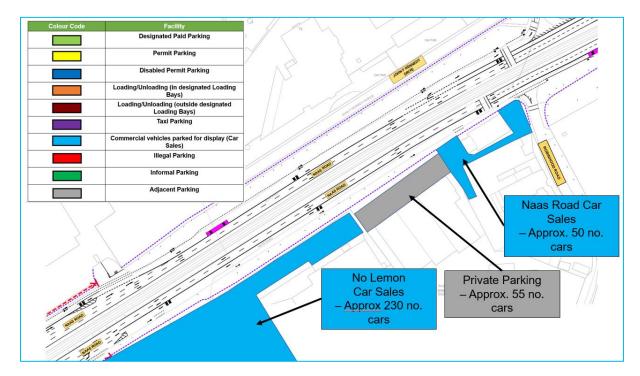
Naas Road between New Nangor Road Junction and Robinhood Road Parking Facilities
